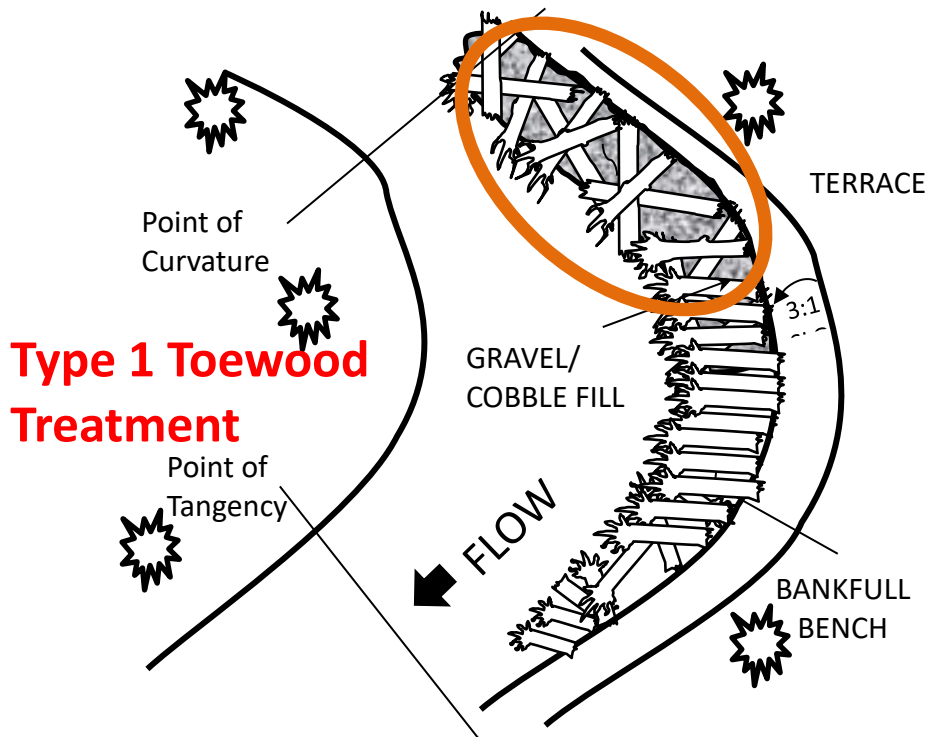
Plan view of the Type 1 toewood treatment concept (circled in orange) and haphazard arrangement of large wood with attached root wads. Sod mats would normally be placed on top of the large wood, brush (not shown) and top soil layers (not shown).
